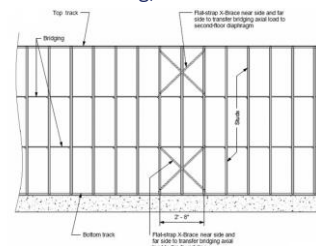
CFS stud-wall flat-strap bracing—diagonal strap bracing anchorage (elevation view)
